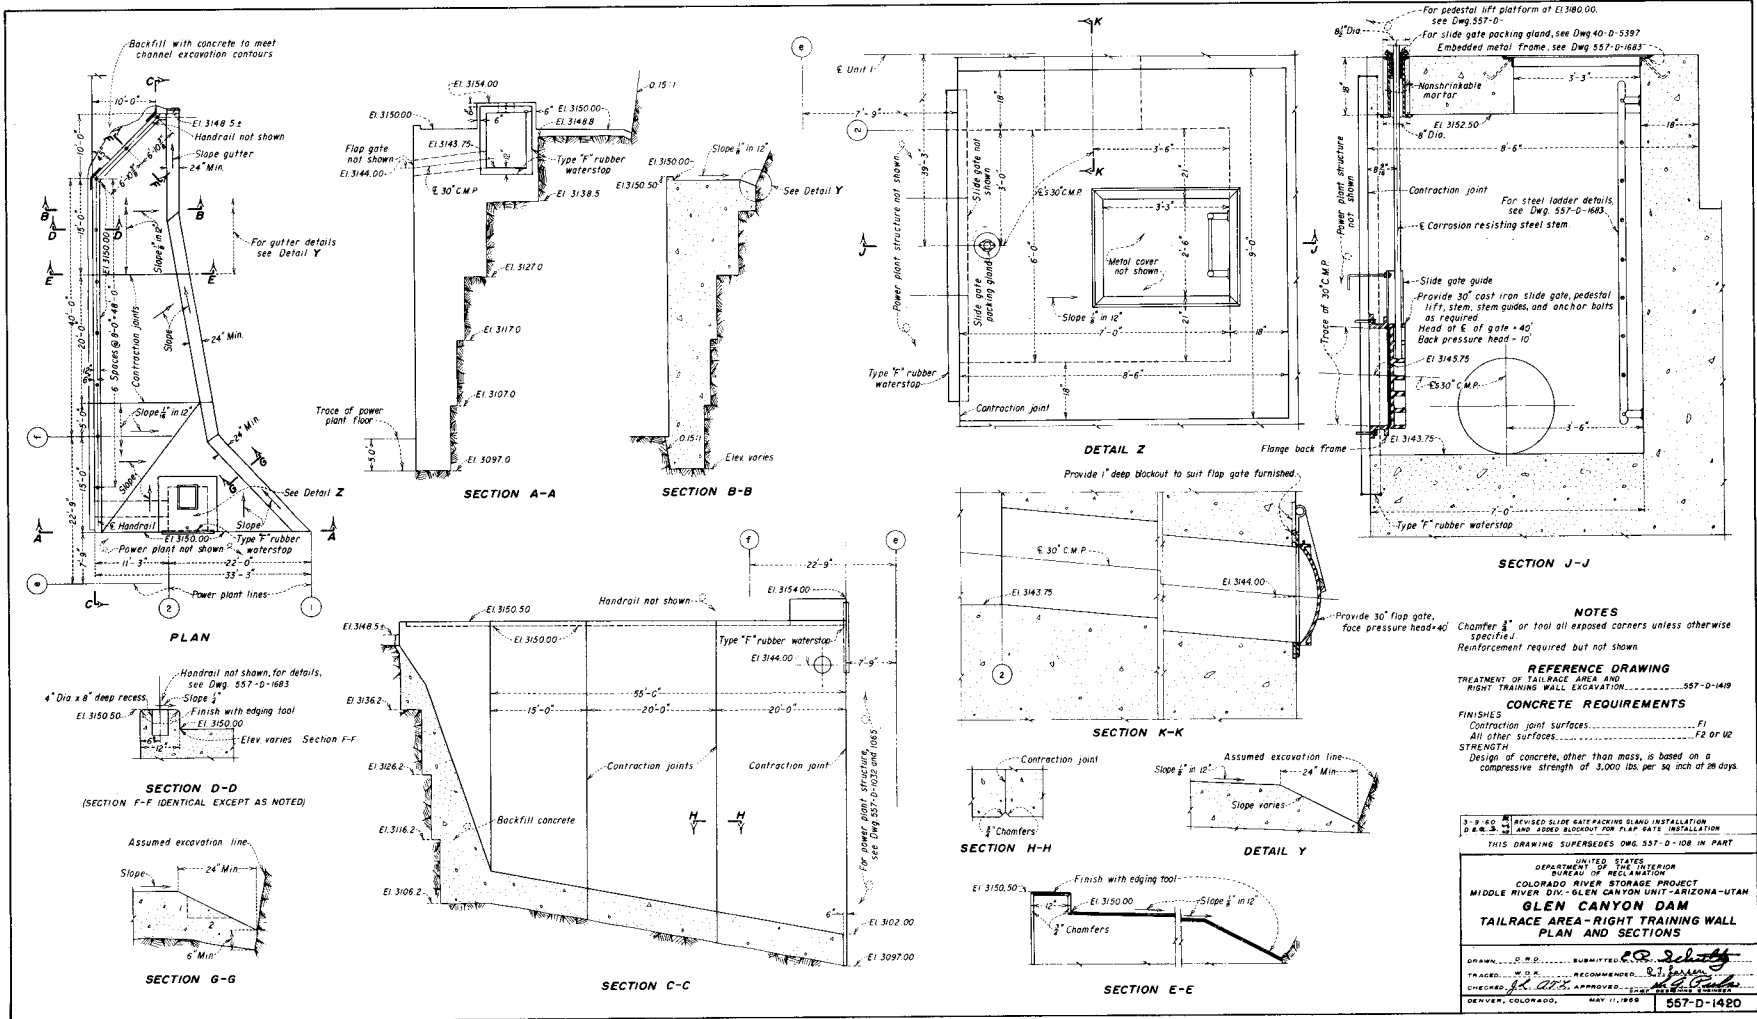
Dam tailrace area—Right training wall—Plan and sections.
